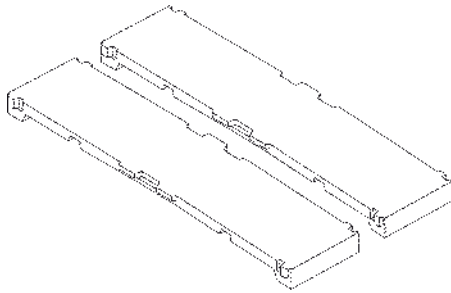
Schematic drawing of two concrete deck elements with dry joints
